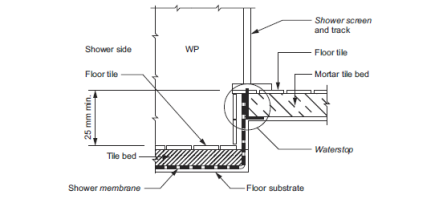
Typical enclosed stepped down shower construction (membrane above tile bed)
